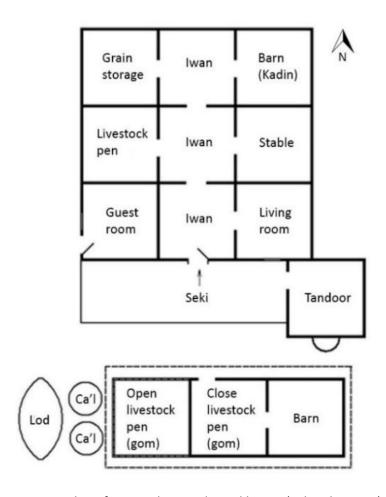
Plan of a typical Suruç domed house (Şahinalp, 2012).
